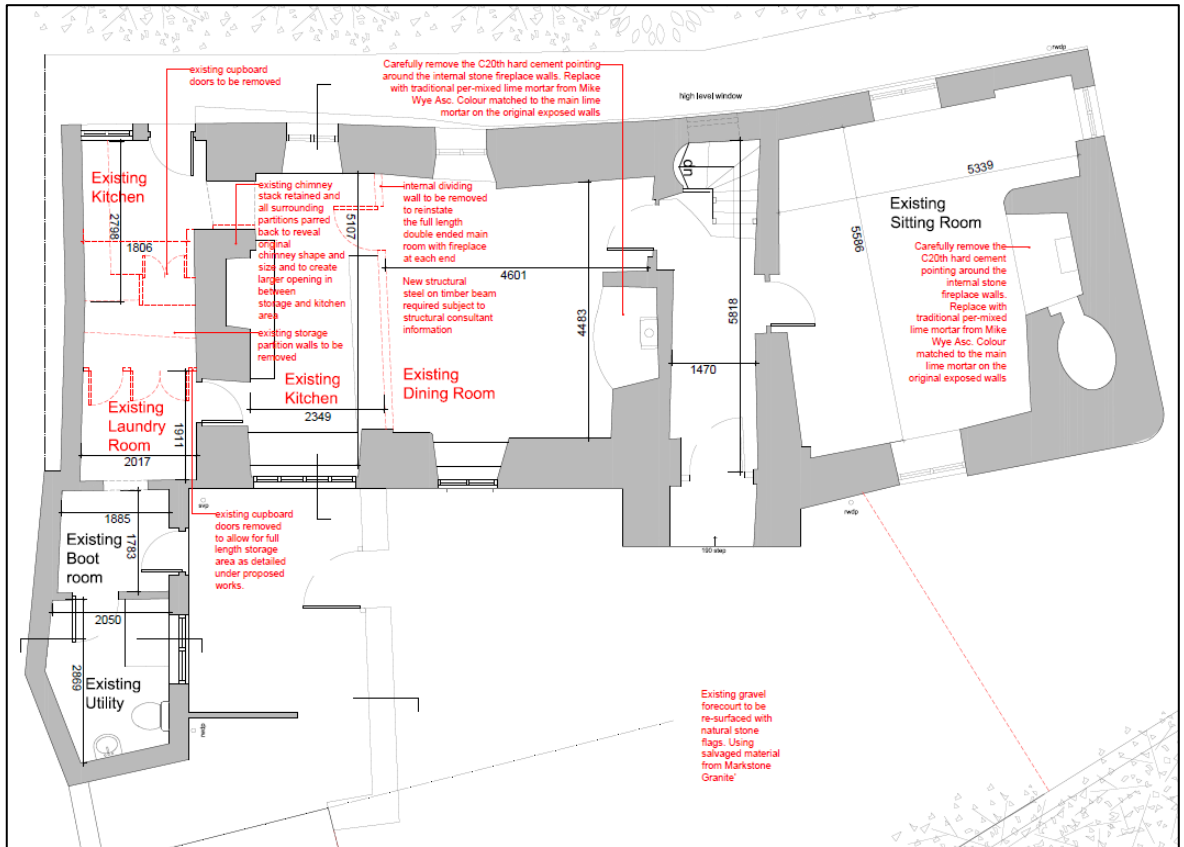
PROPOSED ALTERATIONS TO GROUND FLOOR (SUPPLIED BY CLIENT)
